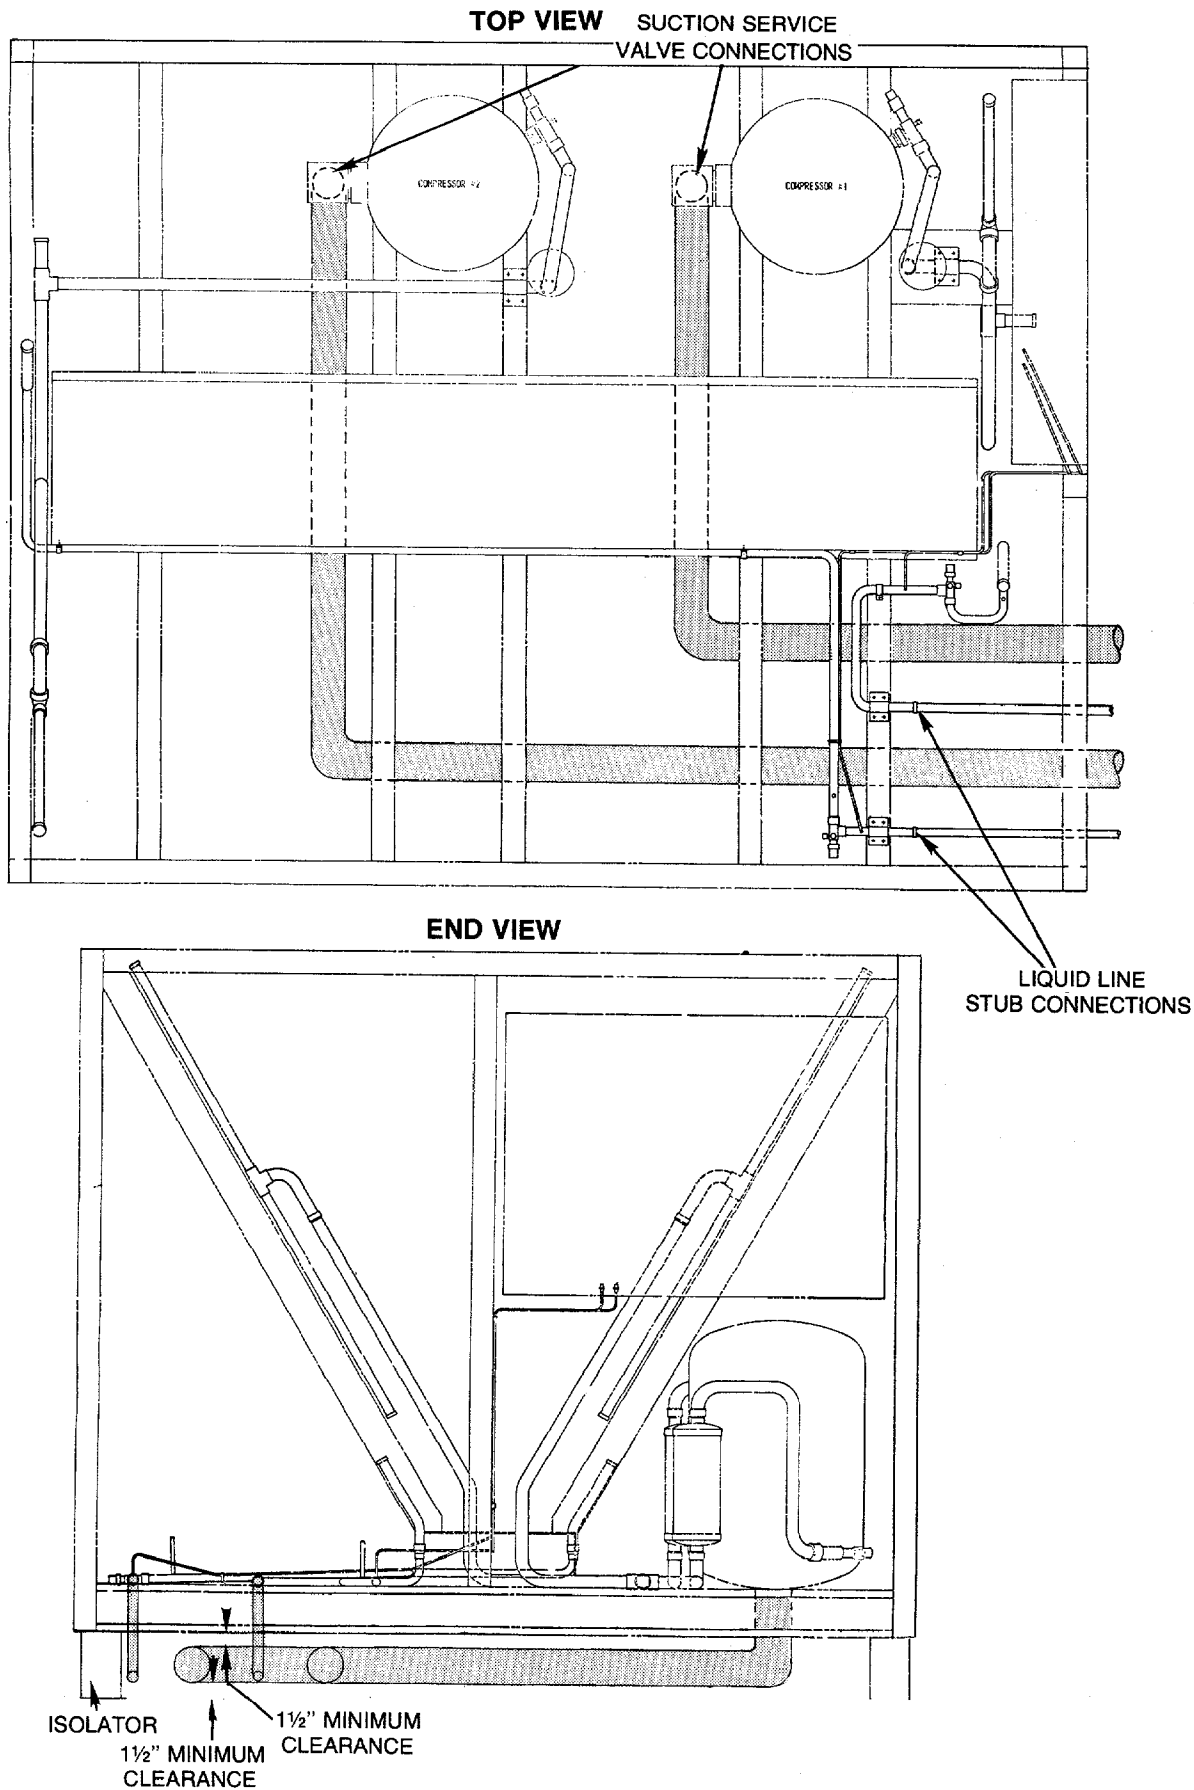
Piping Installation: 40 Through 60-Ton Units Equipped With Isolators
